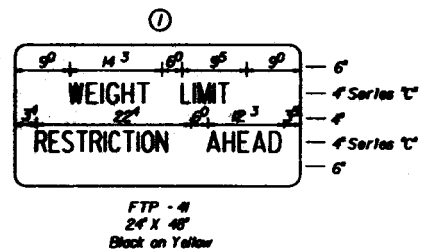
DETAIL / SIGN FACE ON BOTH SIDES OF DROP PIPE
